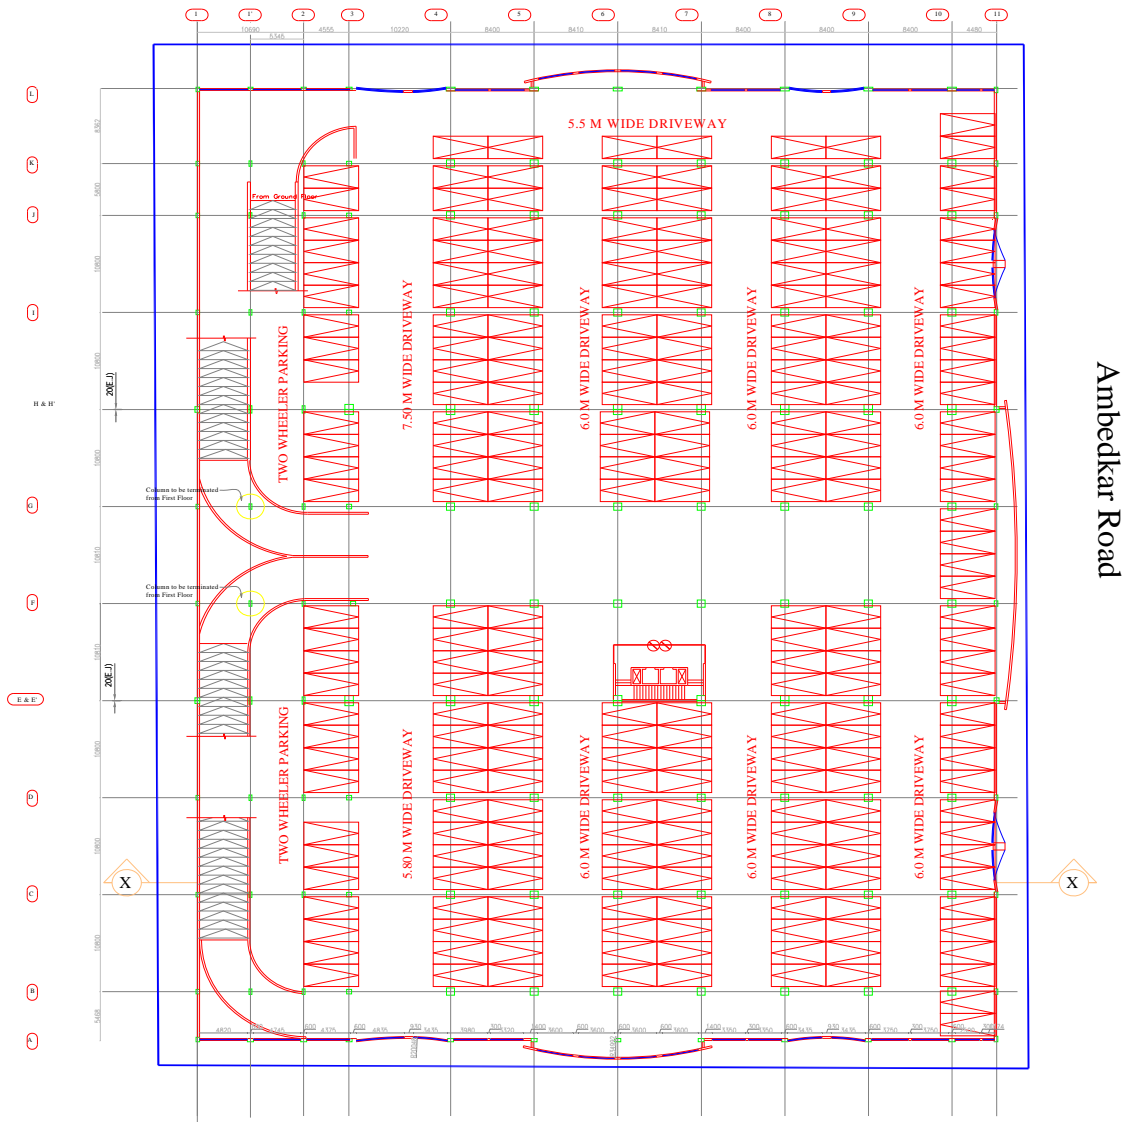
Typical Floor Plan of the Proposed Multilevel Parking Facility
